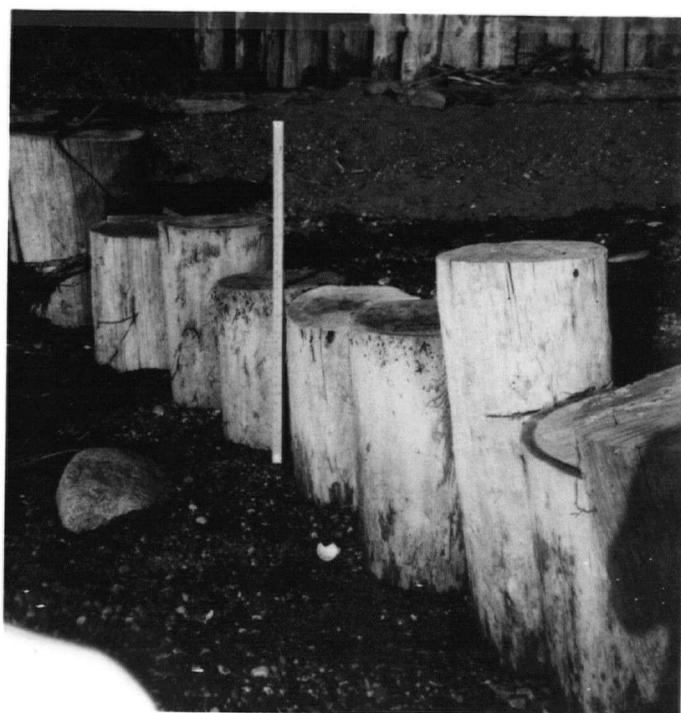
Taken at a groyne on the Tsawwassen beach approximately 400 m. south of the causeway. It shows a drop in beach elevation from south to north (right to left) of approximately 0.5 m.
